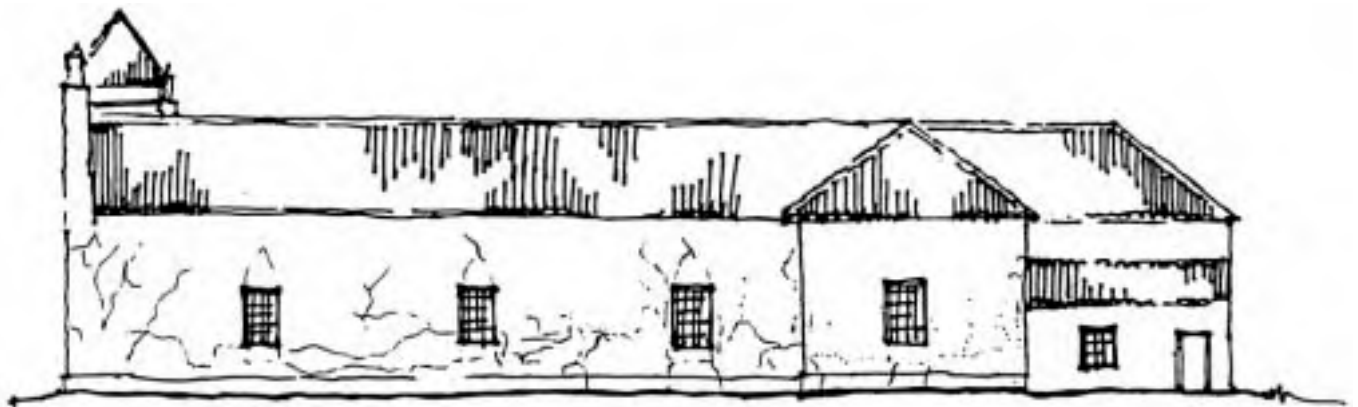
West wall elevation showing existing crack patterns. The pattern does not appear to reflect structural movement
